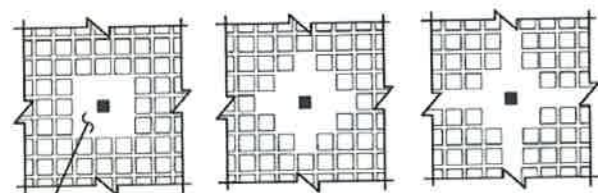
A-2 Examples of Post-Tensioned Waffle Slab Construction
